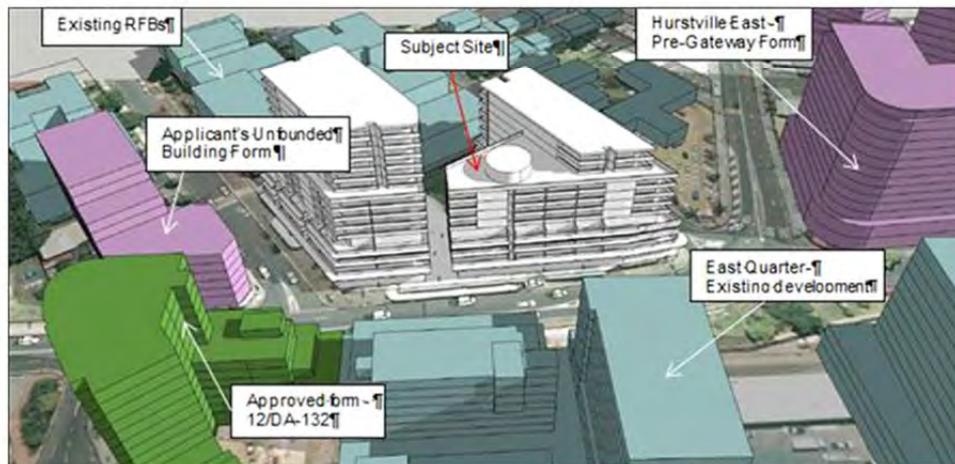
Planning Proposal Birds Eye View – Forest Road (Source: 3D Images - Planning Proposal Revision 6 – 11 March 2016)
